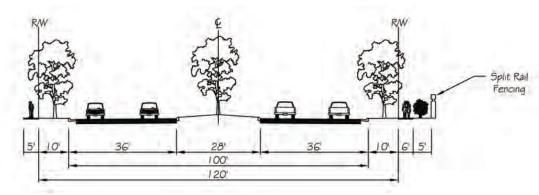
STREET CROSS SECTIONS
